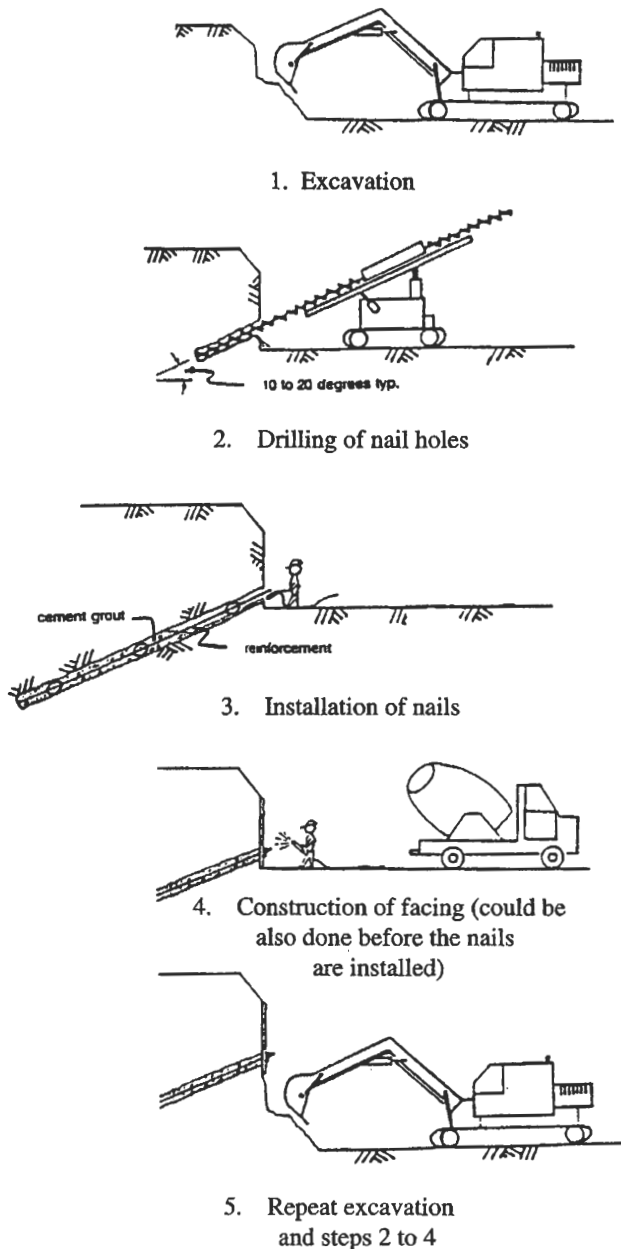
Steps in the construction of a grouted soil-nailed excavation.
